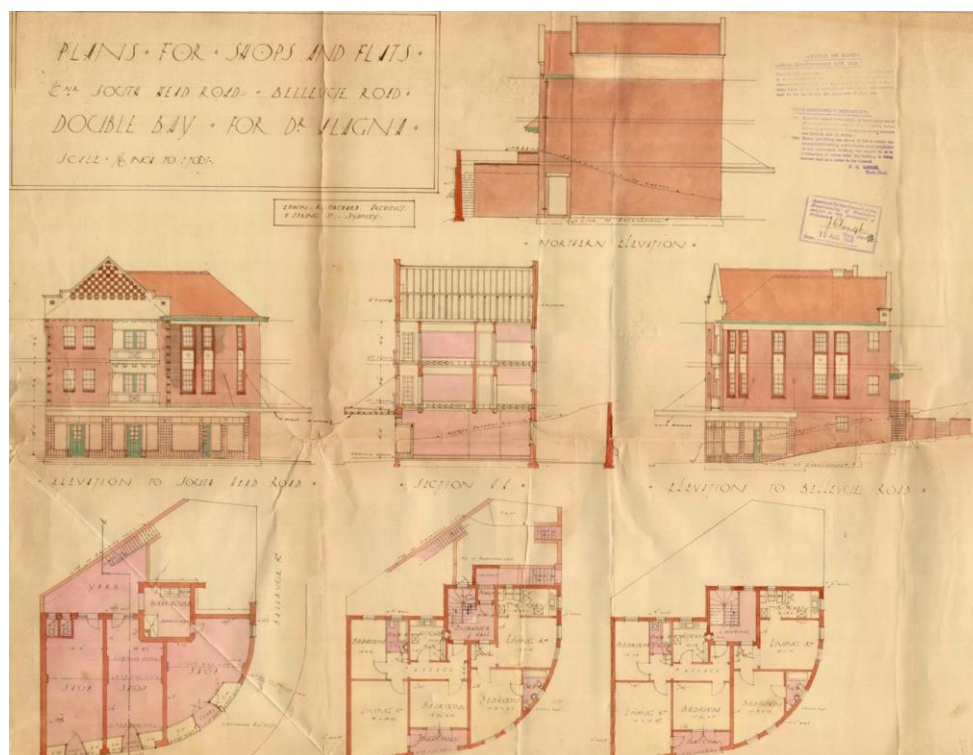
Orchard's building application drawing for Dr Alagna's new development at the corner of New South Head Road and Bellevue Road approved by Woollahra Council in August 1928.
